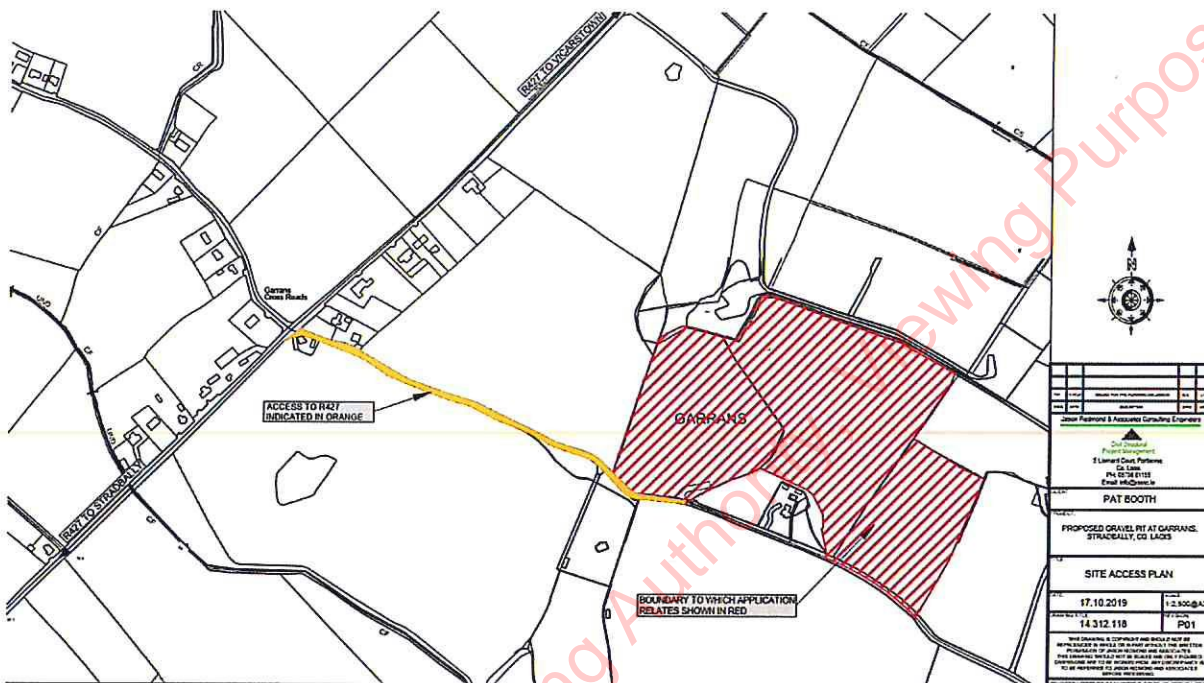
Access Route to/from the Proposed Project (Ref: extracted from planning drawings)
